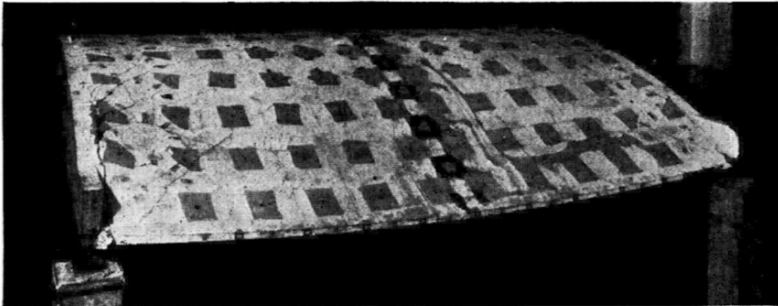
TYPICAL SHORT SHELL AFTER TEST
